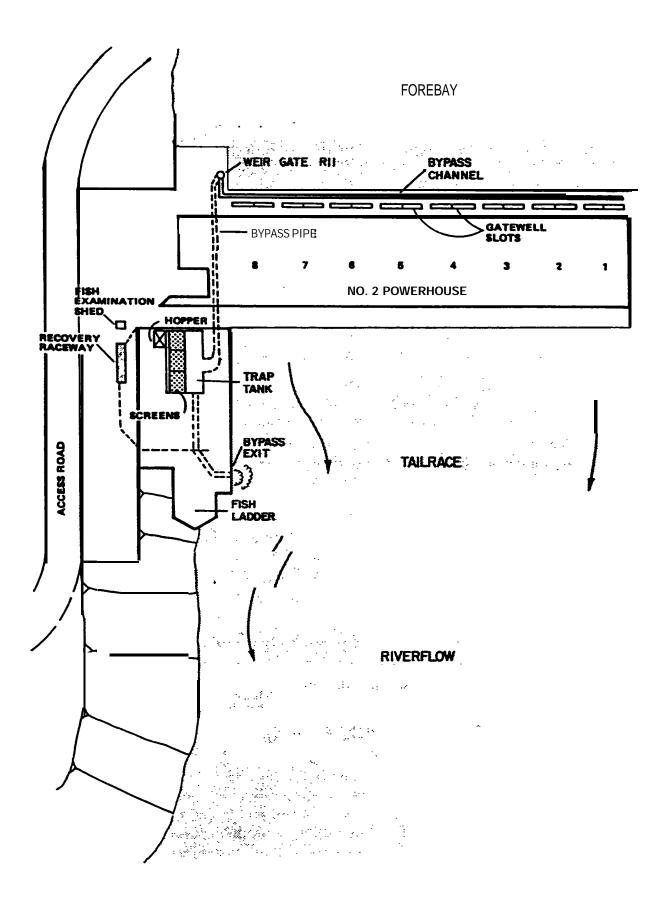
Plan view of juvenile salmonid bypass and collection system at Rock Island Dam second powerhouse (taken from Olson 1983).
